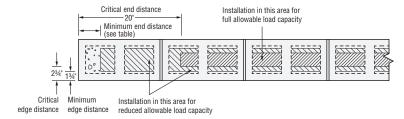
A. Allowable Anchor Locations of ½"- and %"-Diameter Threaded Rod for Full and Reduced Load Capacity When Installation Is in the Top of Fully Grouted CMU Masonry Wall Construction
